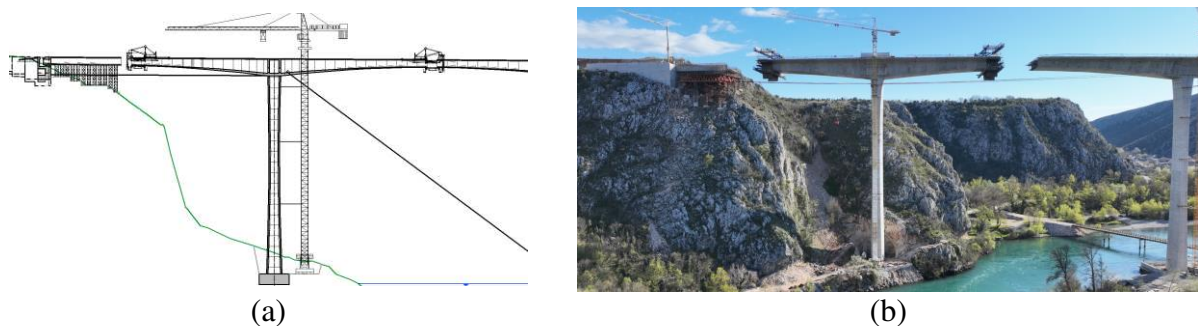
(a) Scheme of a balanced cantilever construction process on a prestressed concrete bridge; (b) Balanced cantilever construction method on a prestressed concrete bridge during construction
